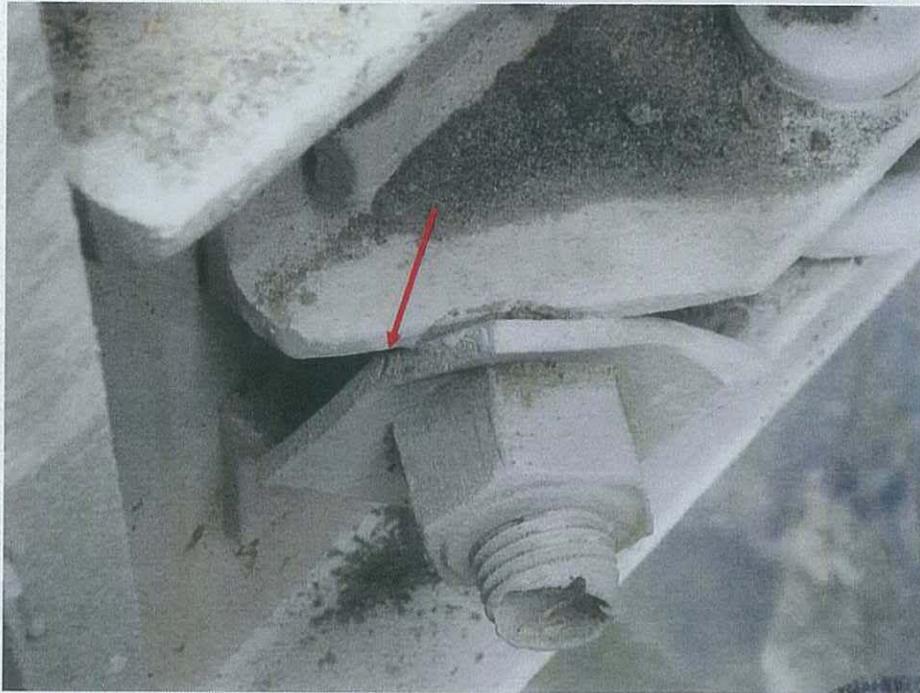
U3 DOWNSTREAM HIP BRACING WITH HOLES & 100% SECTION LOSS AREAS
